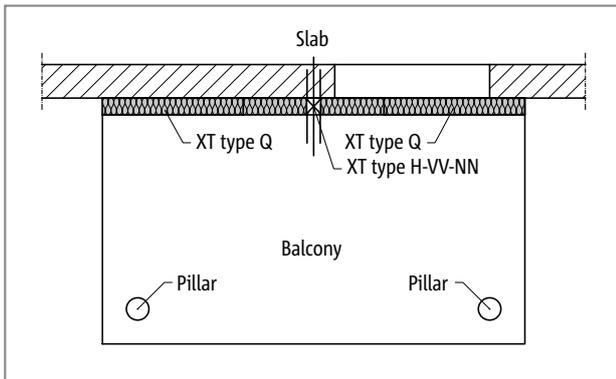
Schöck Isokorb® XT type H: Balcony with column support
